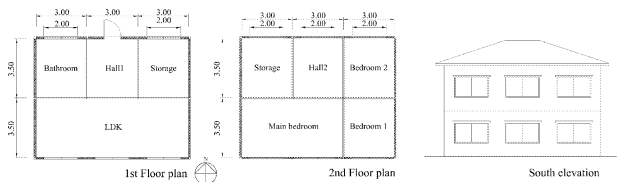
Plan and elevation of the detached house under study used for space cooling load calculation
